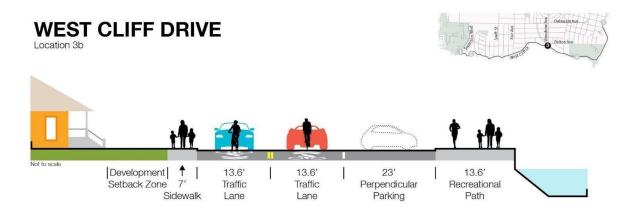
Cross Section of West Cliff Drive Alternative 1 east of Woodrow Avenue
